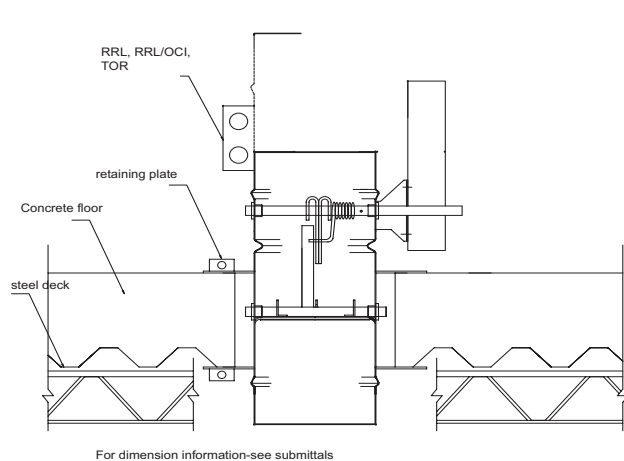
Damper installed in concrete floor with steel deck with actuator above the floor.
